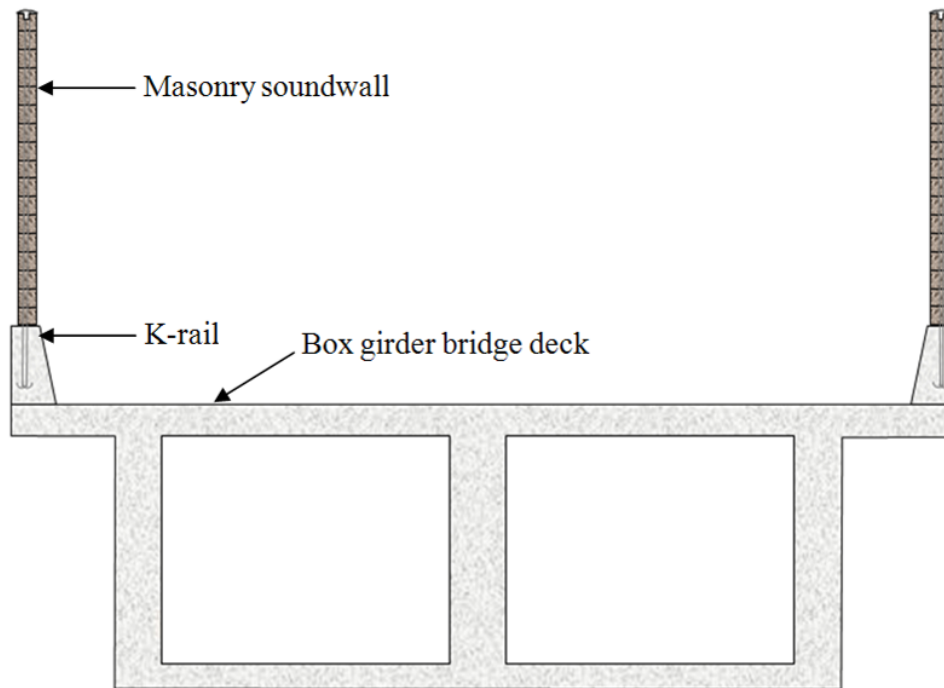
Sound wall placed onto the overhang of a box girder bridge deck
